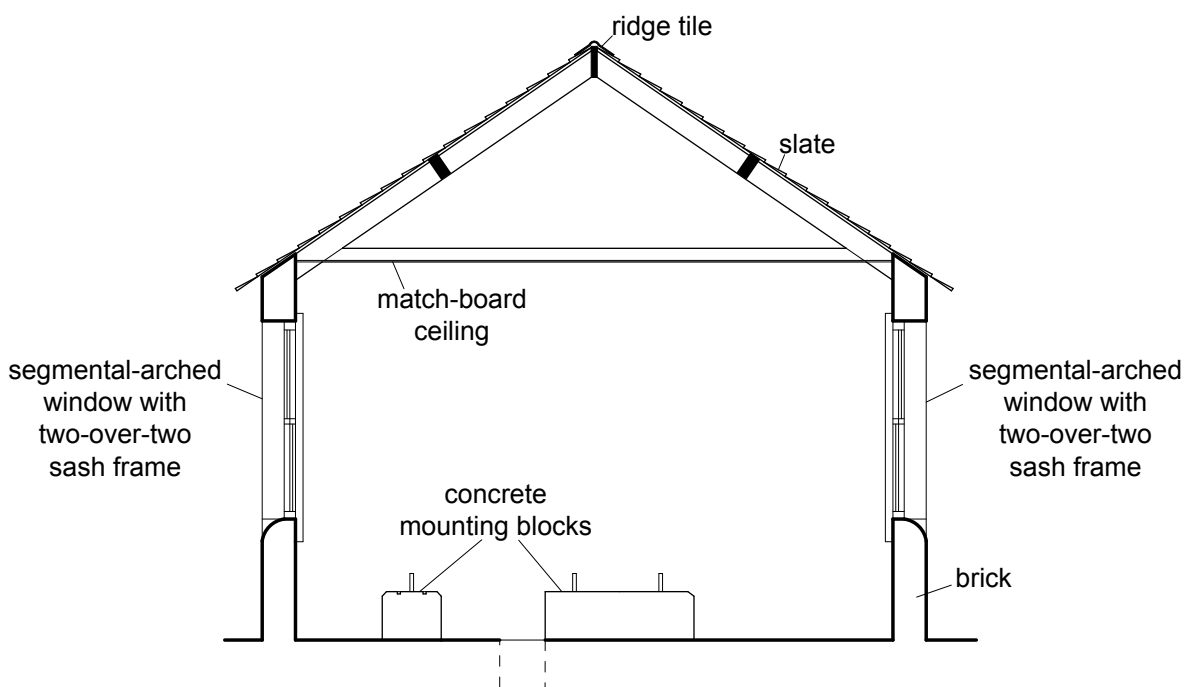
Brodsworth Hall generator house plan (scale 1:50)
